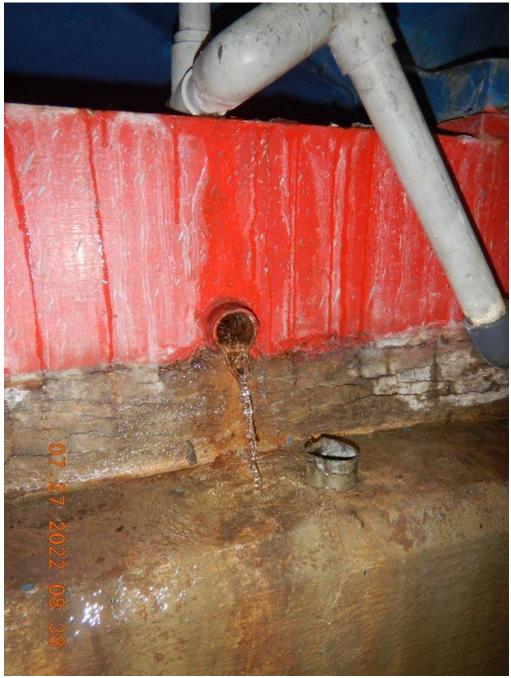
Process water pipe discharging to floor on lower level of Korah 2 and 3 Pump Station
